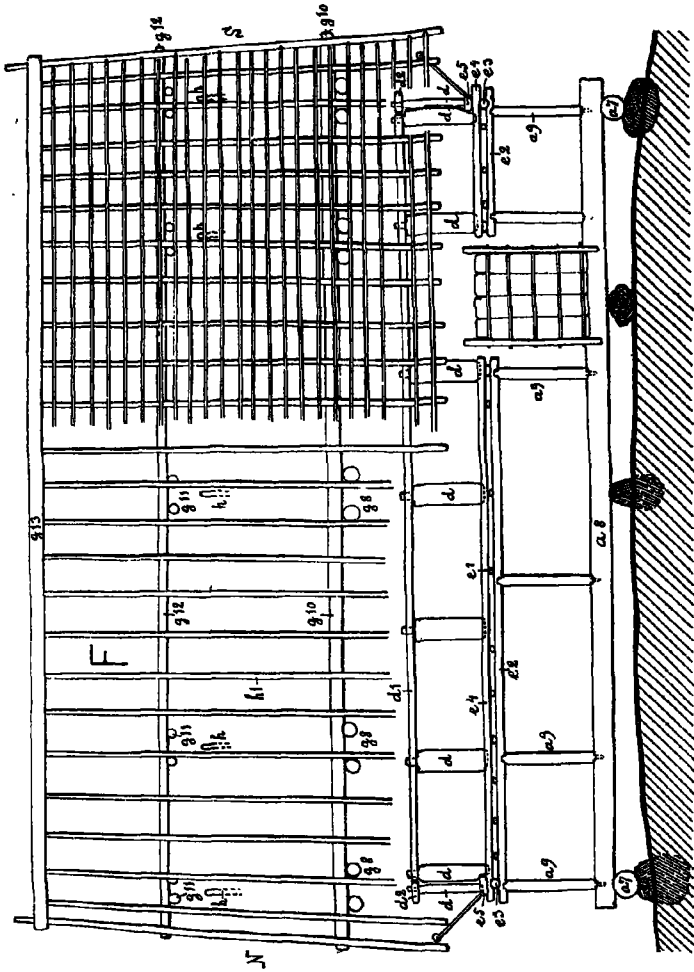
The temple of Siwongi. *a*¹—*a*²: foundation; *d*, *d*²: wall planks; *d*¹, *d*²: wall frame; *e*¹—*e*²: platforms; *g*¹—*g*²: roof-truss; *h*: slanting props.
